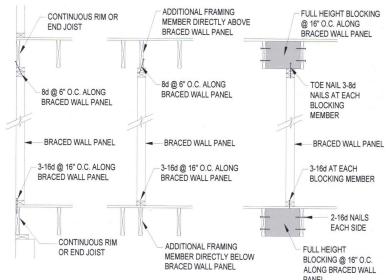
BRACED WALL PANEL CONNECTION WHEN
